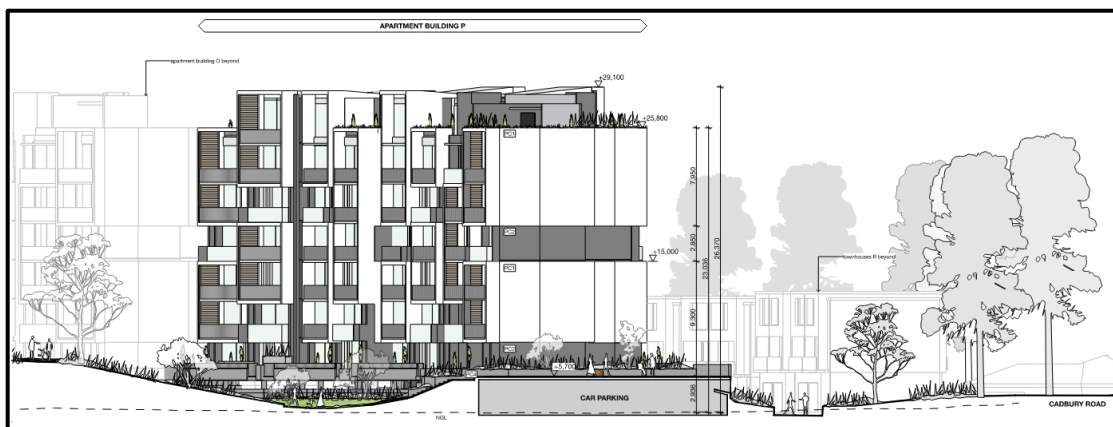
The eastern elevation view of Building P showing other apartment buildings and the townhouses adjacent to the Cadbury Road frontage in the background.
